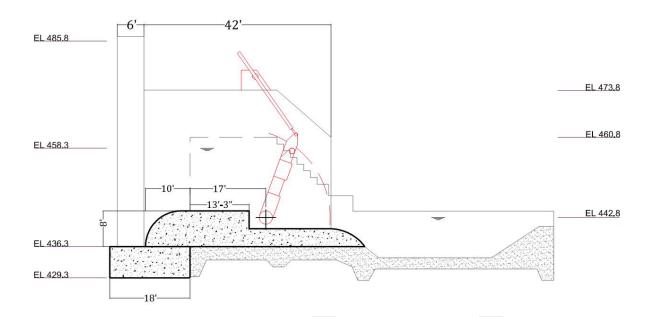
Nolte (Meadow Lake) Spillway Section
